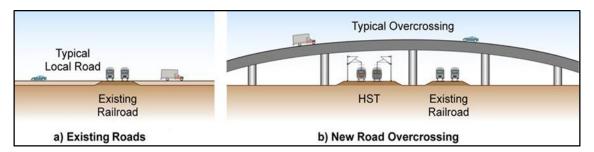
Replacing At-Grade Crossing with Overcrossing
